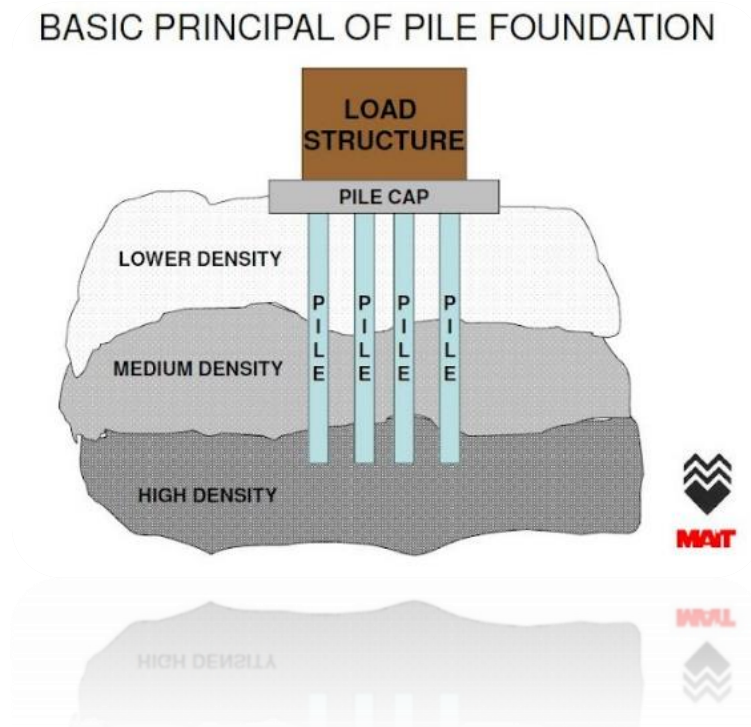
A foundation for the building, with piles inserted into the soil, and pile cap on top of the piles (MAIT, 2013)
